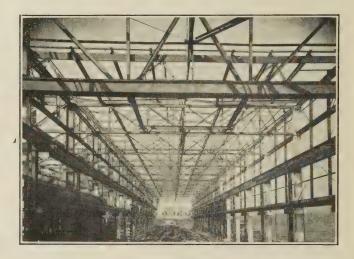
Showing Building with 56-Arc-Welded Roof Trusses of General Electric Co. at West Philadelphia, Pa.
